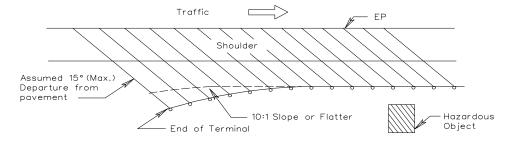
M - SUGGESTED SLOPES FOR APPROACH BARRIERS
